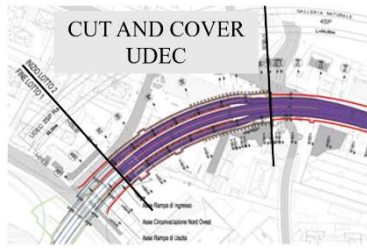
C&C tunnel plan view (Donelli et al. 2022, modified by the authors).
